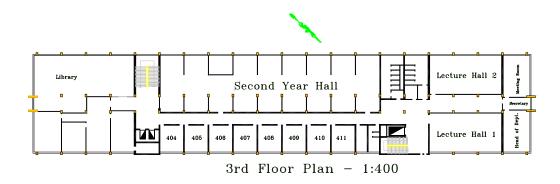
A typical floor plan of the Architecture Department in Cairo University.
